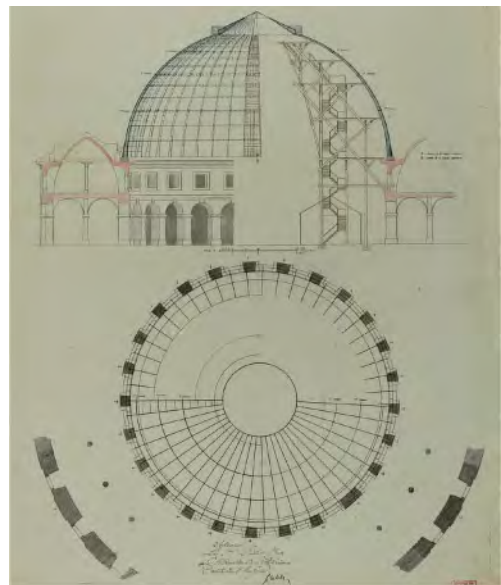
Plan and section of the Halle au Blé, with an outline of the scaffolding. Hittorff coll., H.B. 008, Wallraf-Richartz Museum. Ph. D. Bongartz.
